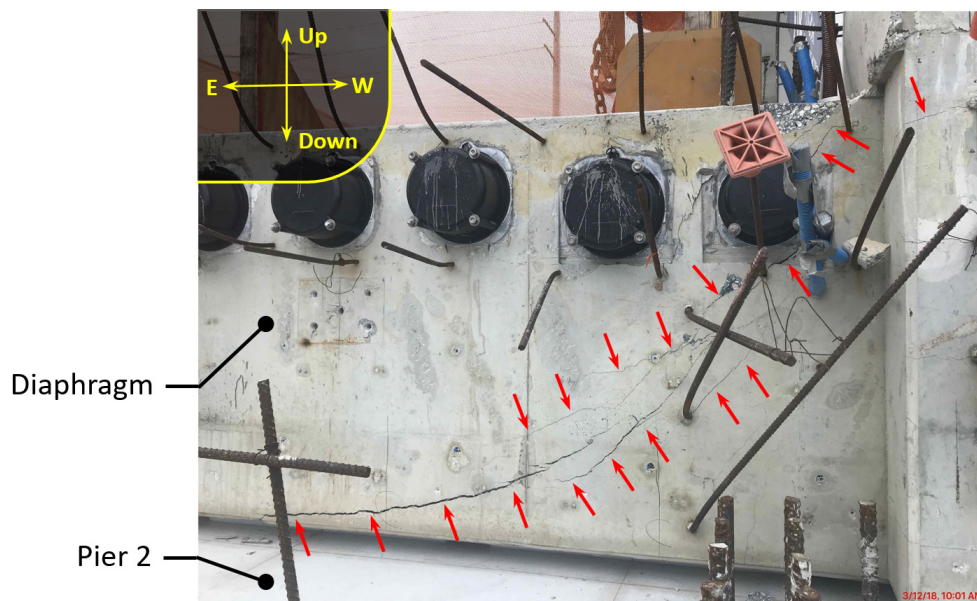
Photograph showing the north face of the north diaphragm immediately east of truss member 12 on March 12, 2018 at 10:01 a.m. Corresponds to Bridge Factors Factual Report Photo 69.
